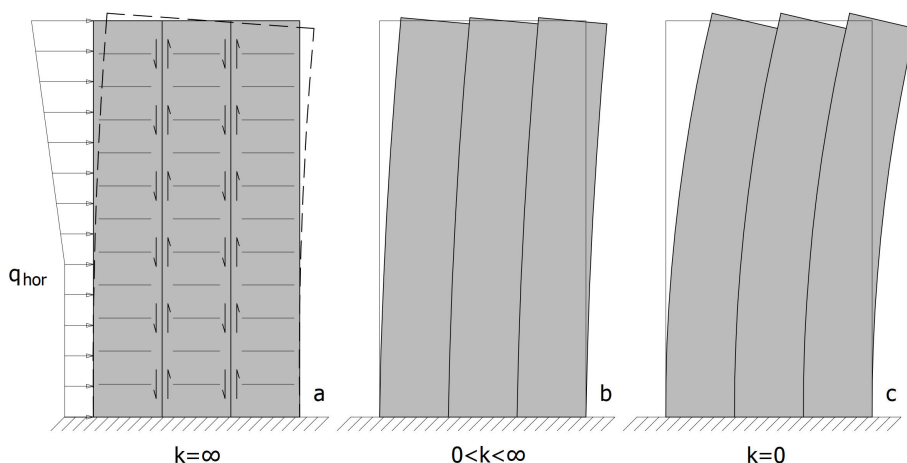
Shear wall structure with vertical connections ( $k$  = shear stiffness); Transfer of shear forces and monolithic deformation (a), typical deformed shape due to vertical connections (b) and deformed shape without vertical connections (c)
